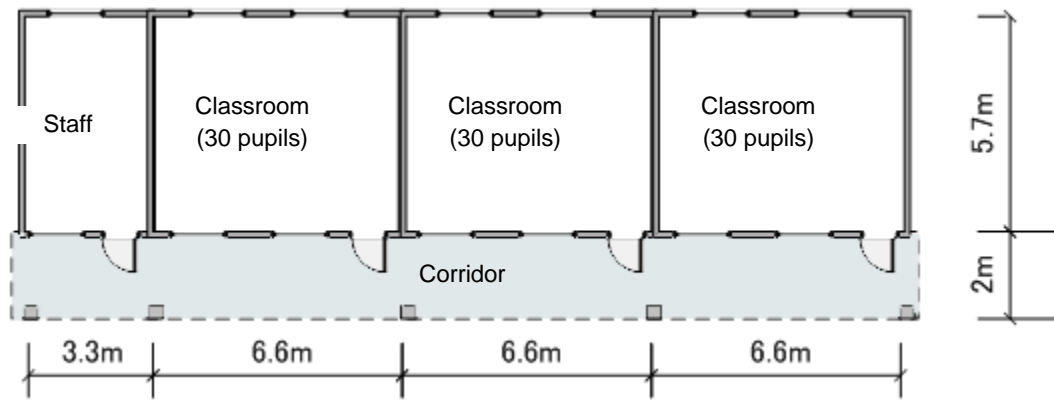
Standard Plan for Three Classroom Type Elementary School
